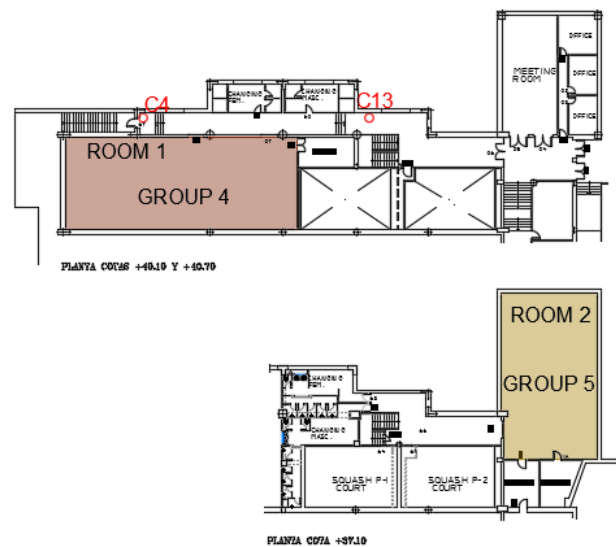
Plan of the floor -2 and -3 of the Sports Centre of the UC – (University of Cantabria, 2016)
